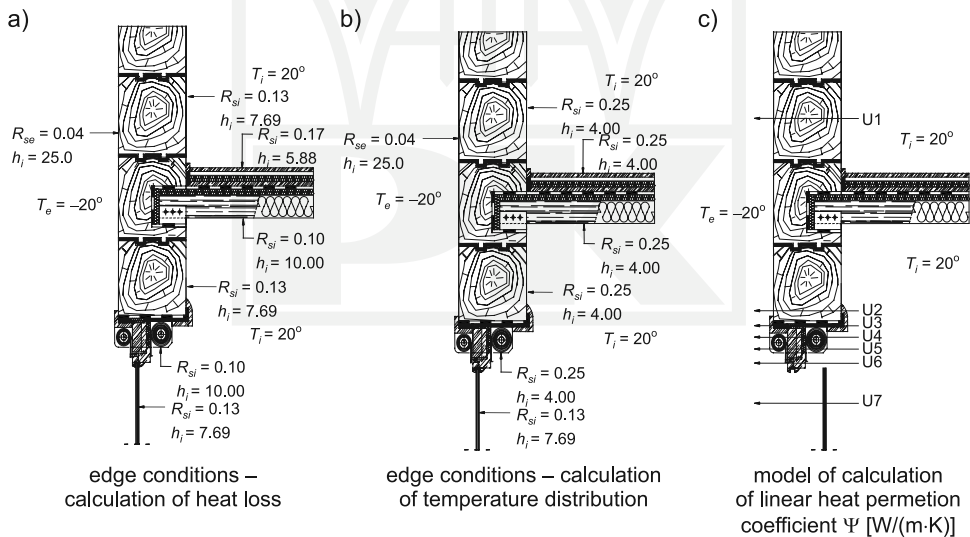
Connection of an outer wall of wooden beams with a roof in a cross section of a wall rim and lintel with a window [3]
